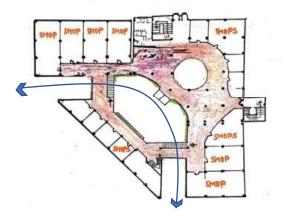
Open Plan Concept (Source: Bhandari 2016)
